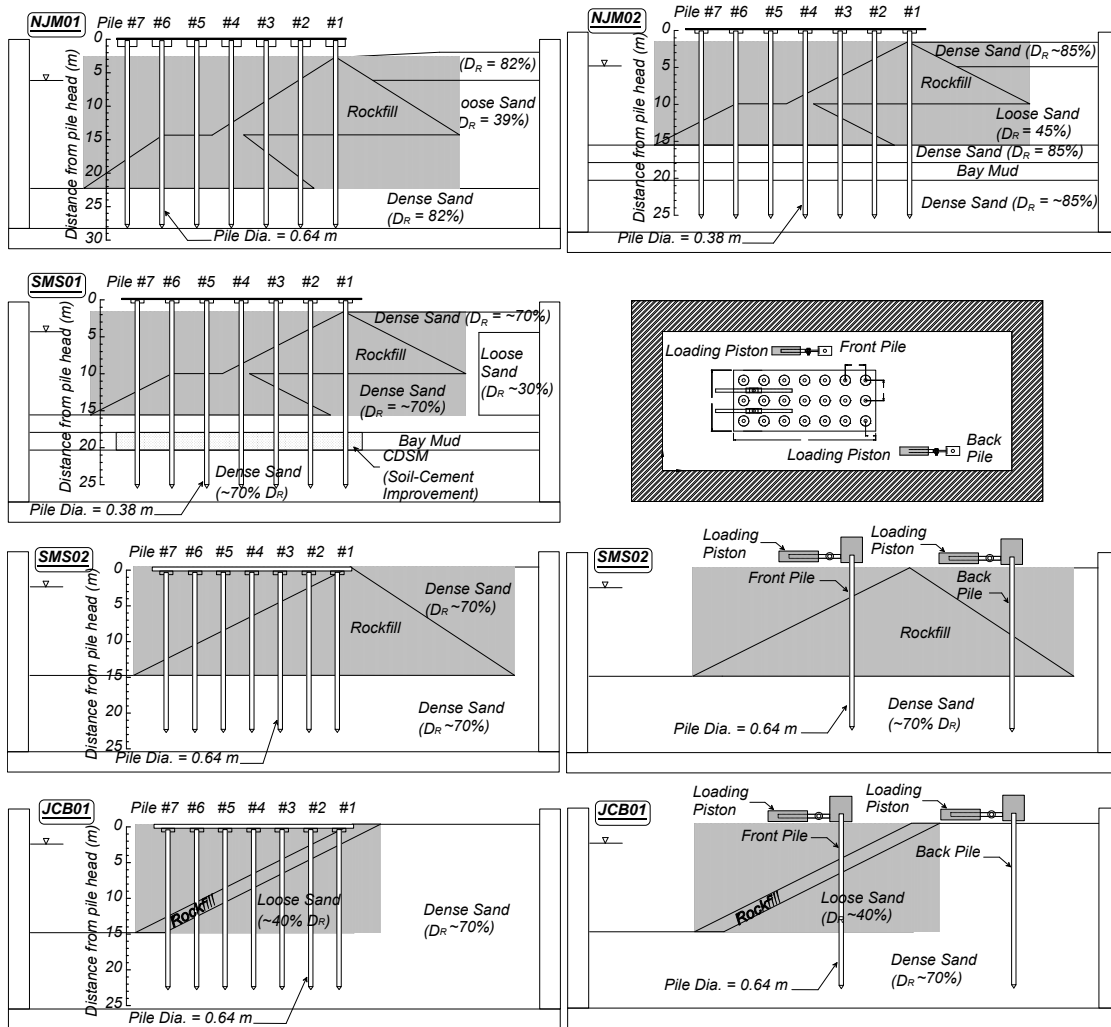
Cross sections and plan view of five centrifuge tests on pile-supported wharves.
